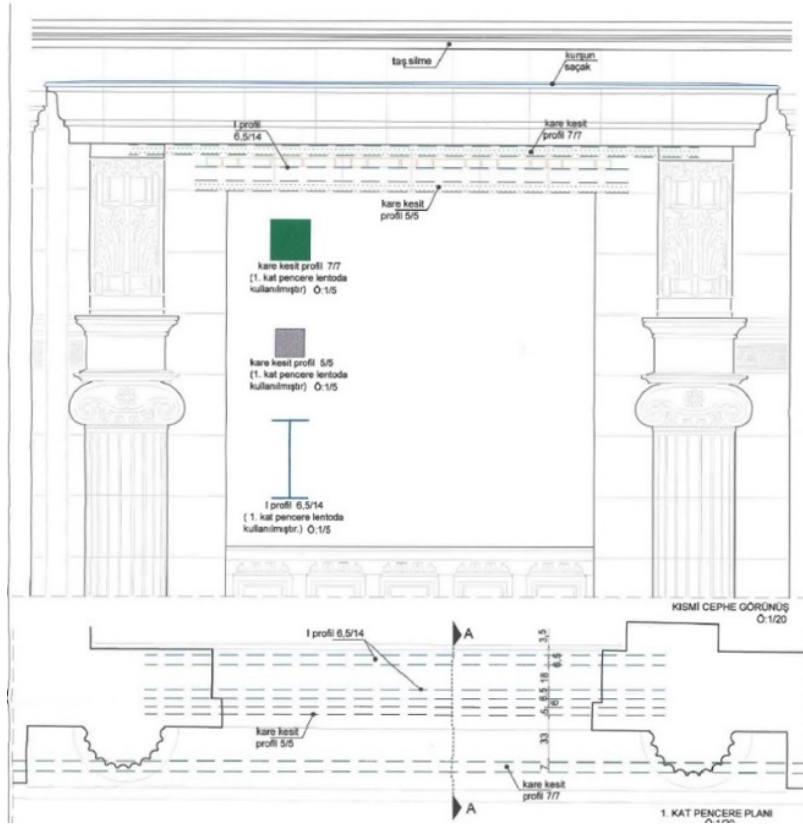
First floor window elevation detail of 3<sup>rd</sup> Construction Phase of IAM (Report of *Güryapı İnşaat* Company, Subat-2012, drawn by Rabia Şengün from IDSM Archive)
